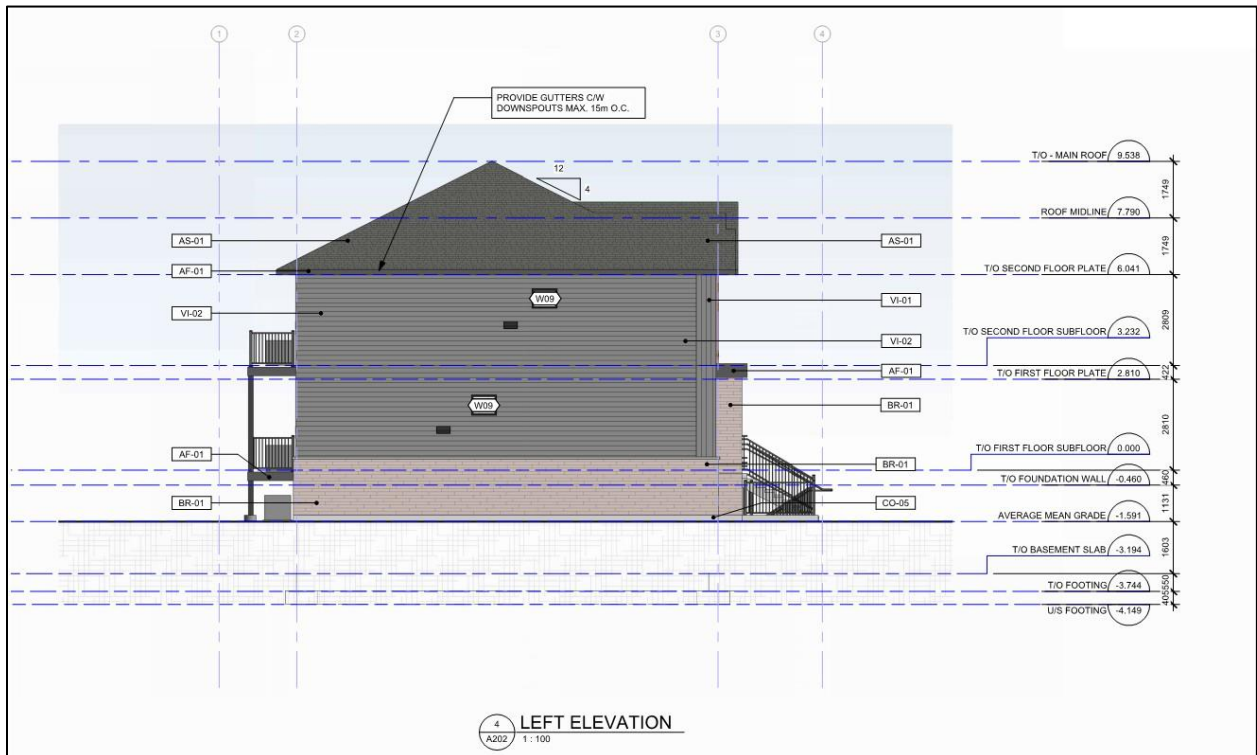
Left elevation of the stacked low-rise building prepared by RLA Architecture Inc.
